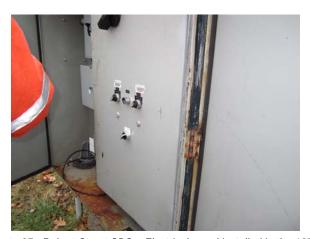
Robert Street SPS - Electrical panel installed in the 1970s
